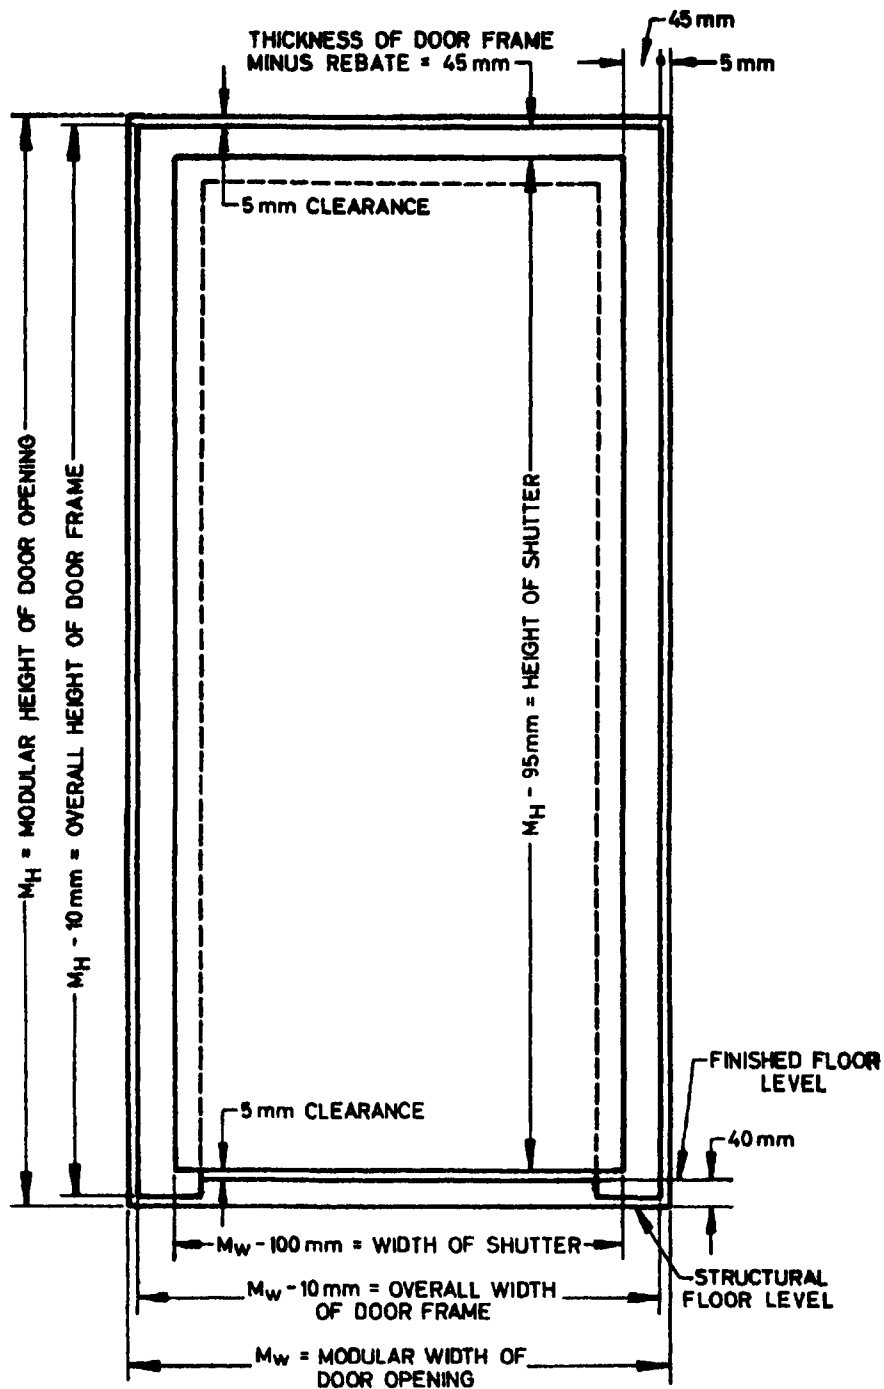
SKETCH ILLUSTRATING DIMENSIONS OF SHUTTER
